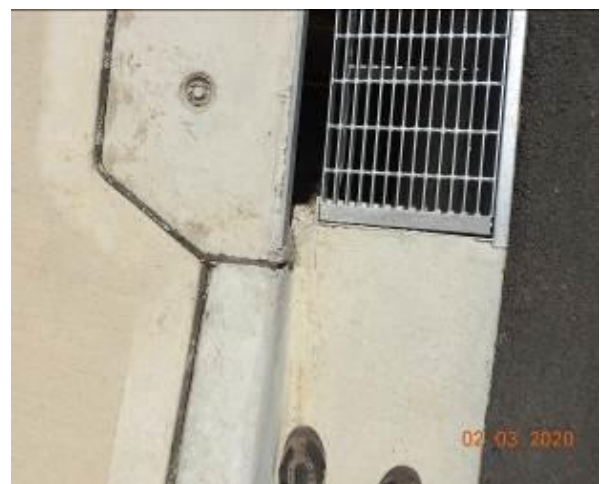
Crack propagation through stormwater inlet pit
